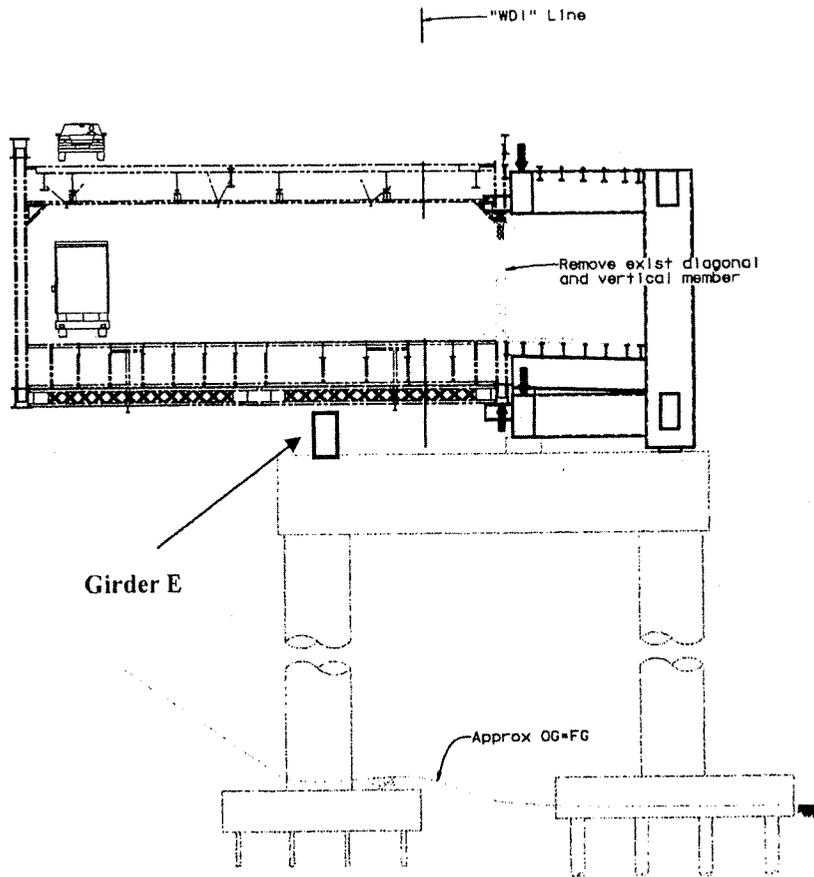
Stage 3 – Deactivation and removal of South Truss members
